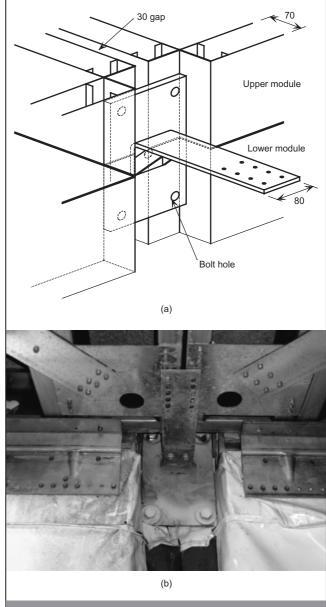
Connection detail between the corridor cassette and modules: (a) sketch detail; (b) actual detail
